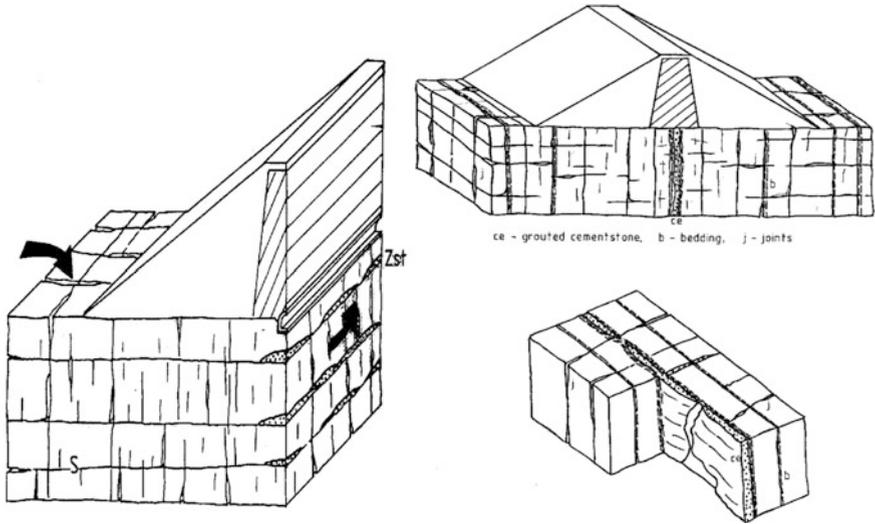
Groutstone pillows intercalated along horizontal bedding planes have little hydraulic effect only (left), vertical pillows are possible only in exceptional cases (right)
